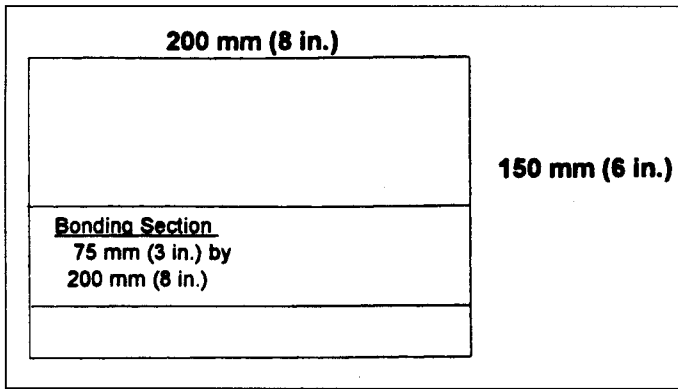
Plan-view of the bonding section of the EPDM sheet.
